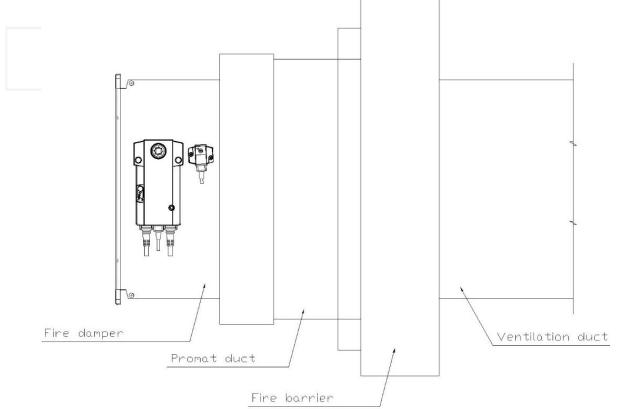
Installation of fire dampers KWP-L away from wall construction according to point 2
